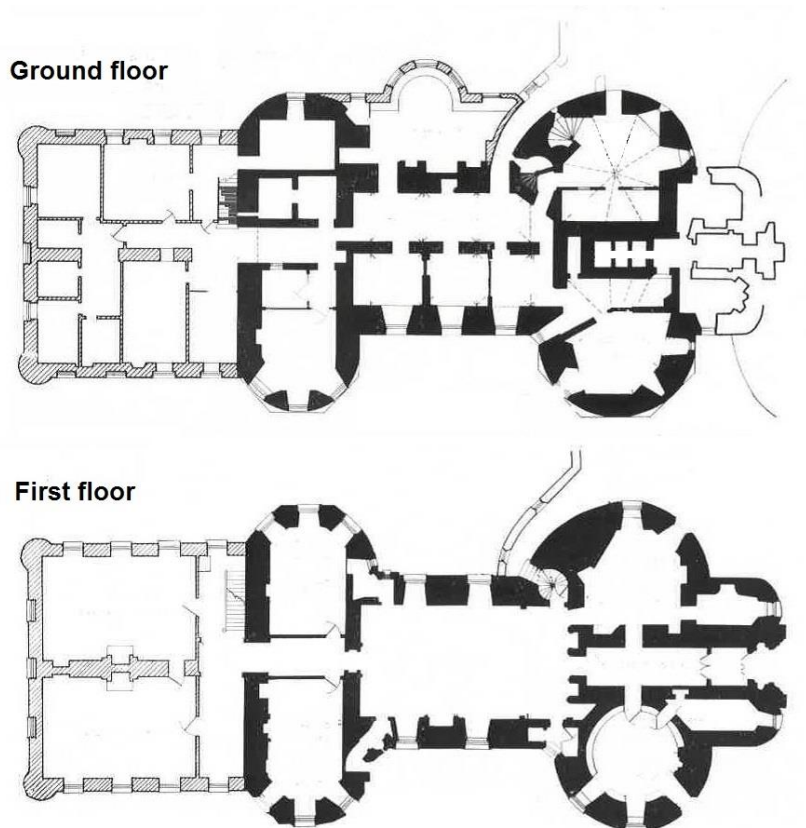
Ground- and first-floor plans of Picton Castle in 1960 (from Girouard 1960, Figs. 6 and 11)
